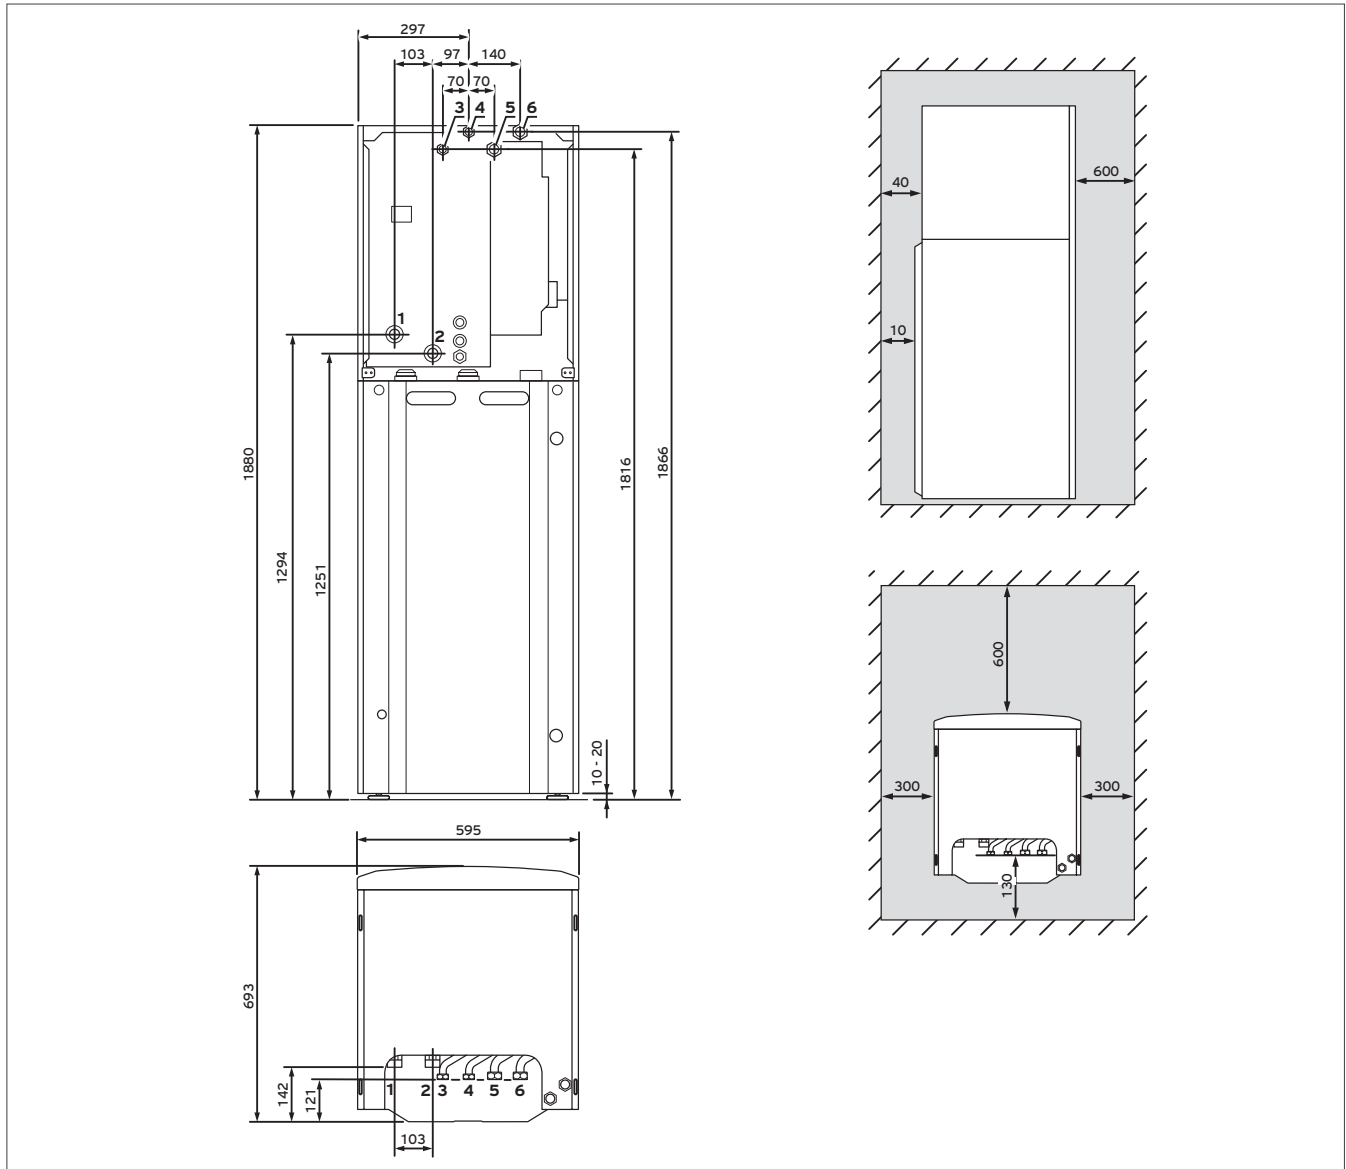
uniTOWER VIH QW 190/6 E dimension drawing and connection dimensions
